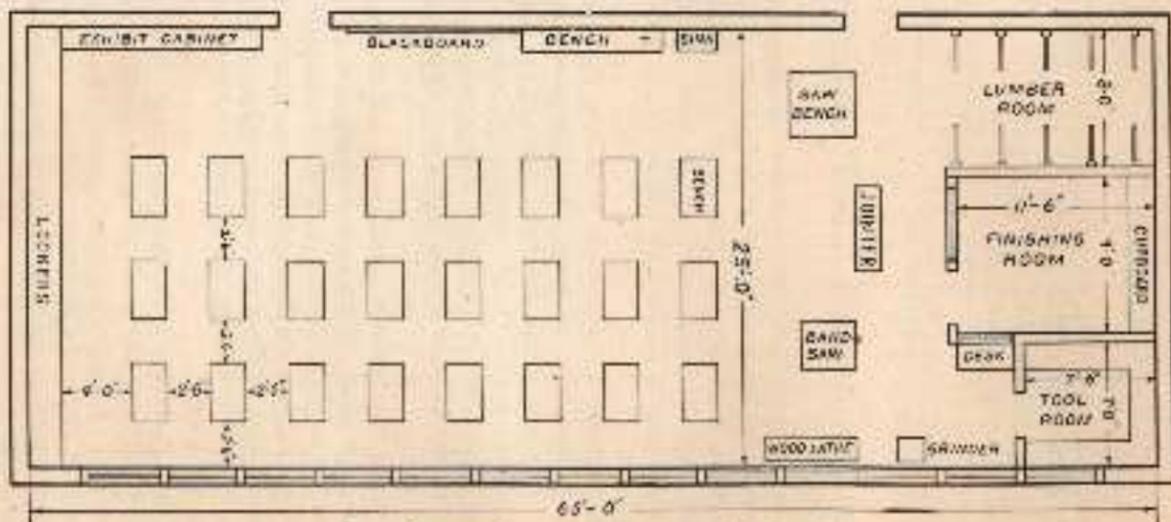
Suggested layout for 24-bench woodworking shop.
